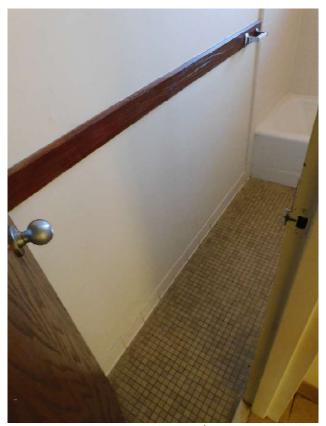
Dogwood Terrace Building 3A-2/Interior, typical bathroom.
